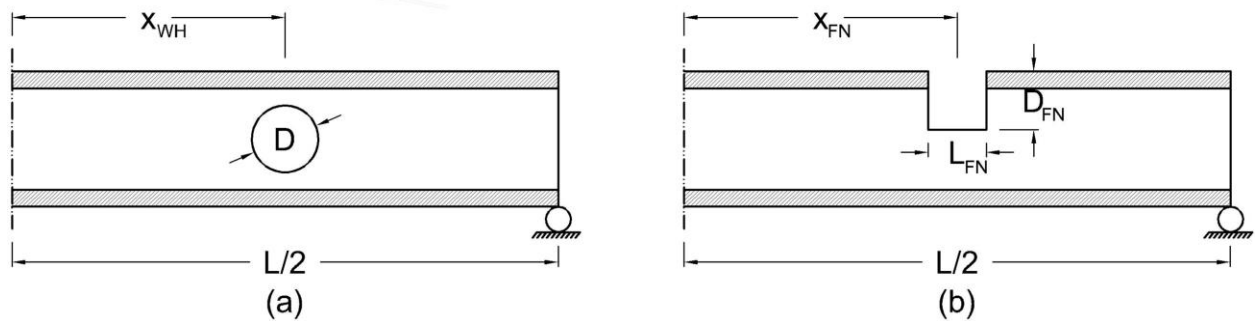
Schematic drawing of beams with (a) web openings and (b) flange notches
